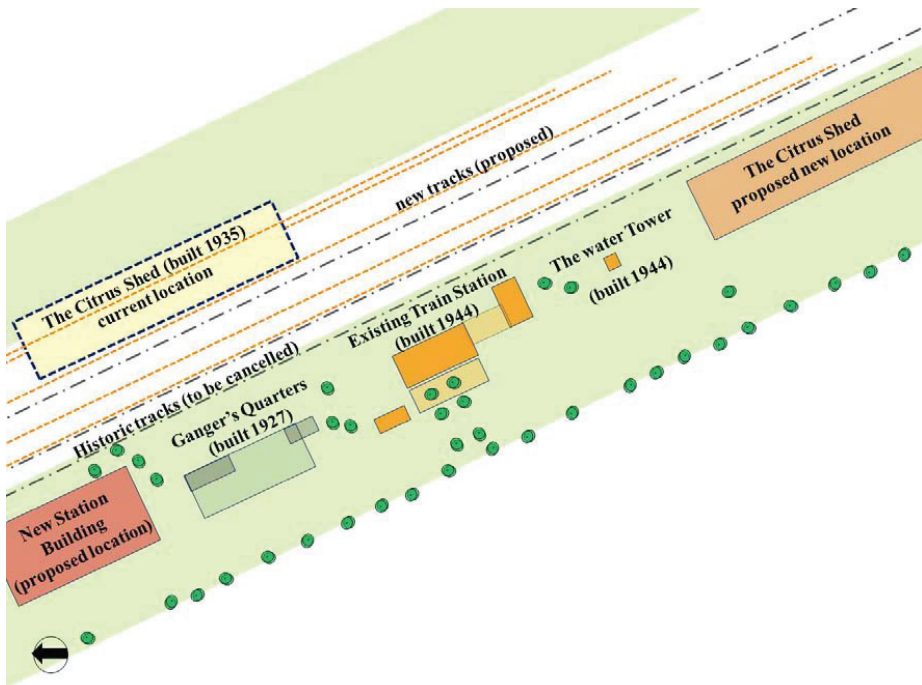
Schematic plan of the historic core at Hadera East station, showing proposed development.
